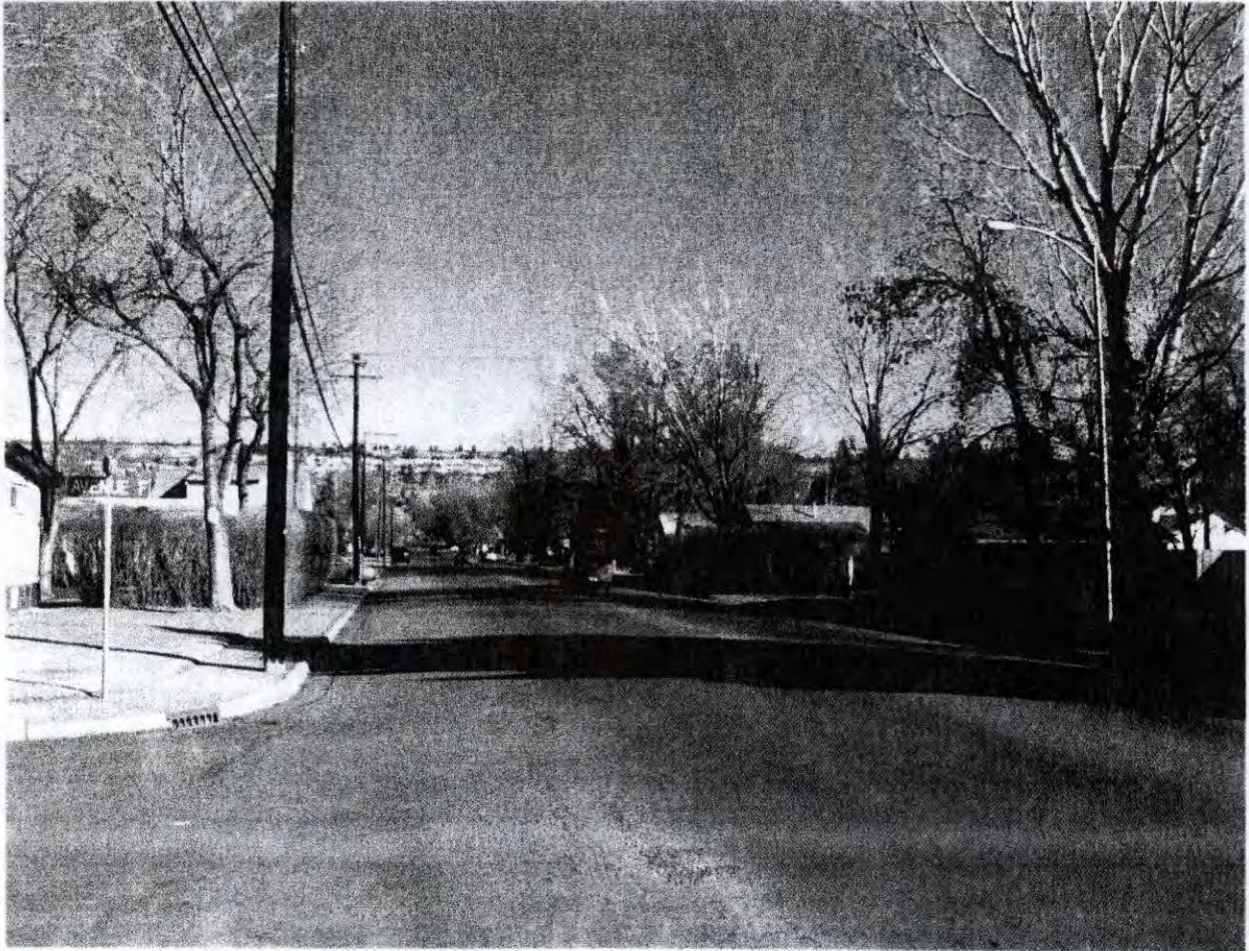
Overview of project area looking north along 13th Street West from the intersection of Avenue F.
